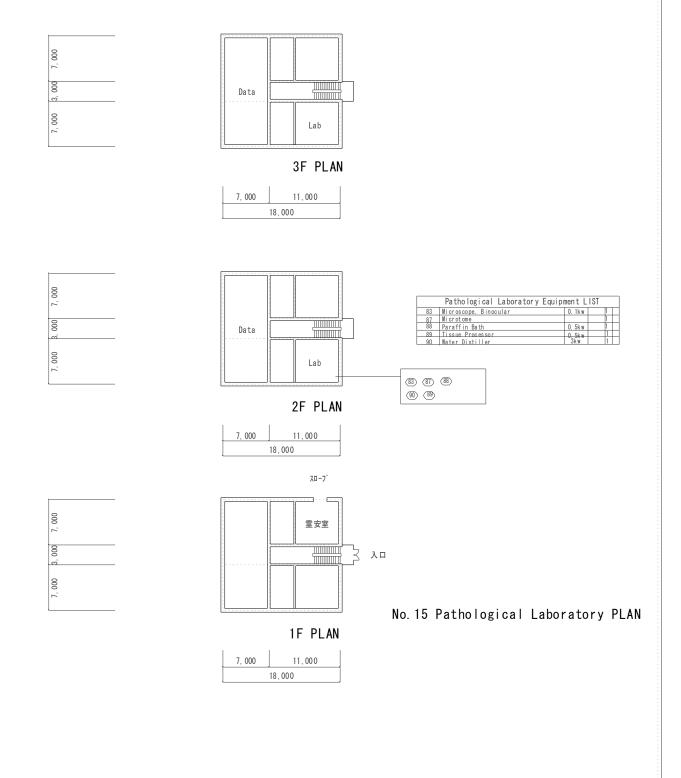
No. 15 1F • 2F • 3F PLAN S=1:500
